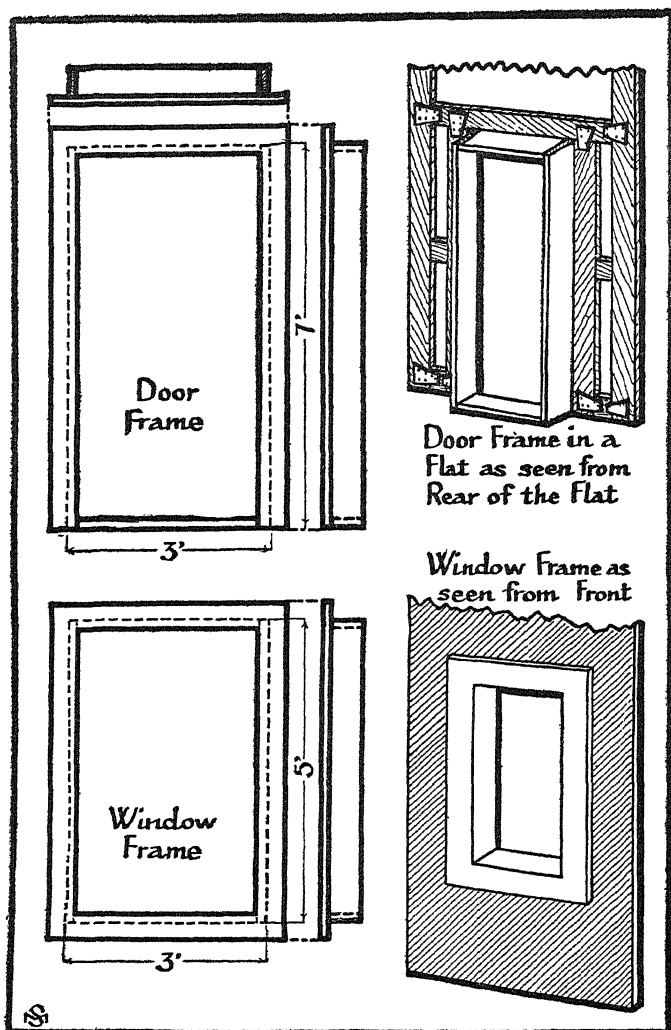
DOOR AND WINDOW FRAMES (TO FIT FLATS SHOWN IN PLANS ON PAGE 115.)
